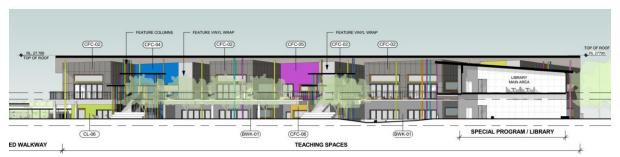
Elevation of the teaching spaces building and section drawing of the library.
